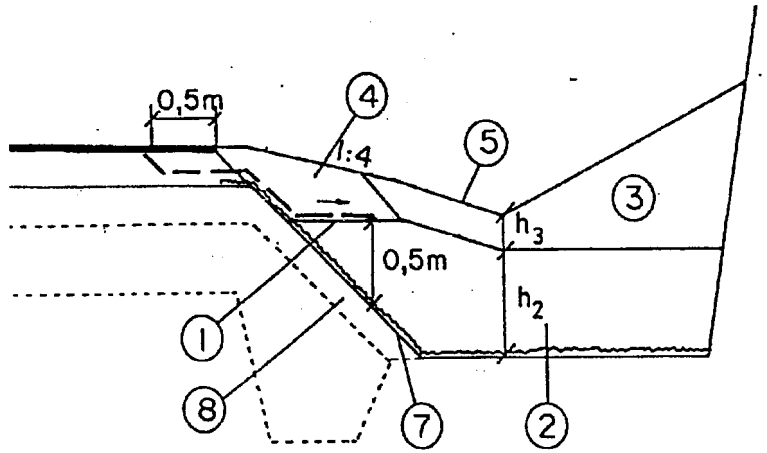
Road structure in rock cut. Guideline for slope protection.*)
